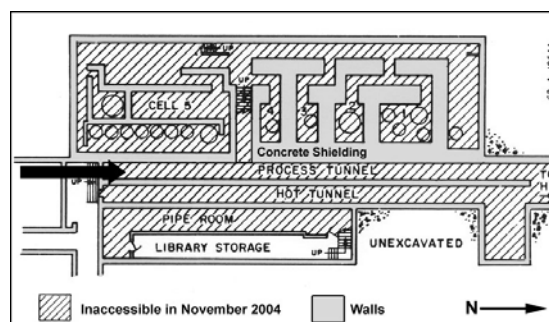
Building G2, Basement, 325-Foot Level, Process Tunnel
